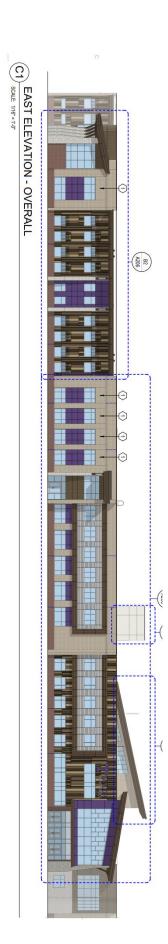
Exhibit B - Site Plans, Elevations, & Landscaping Plan Vehicular Access Vehicular Access
